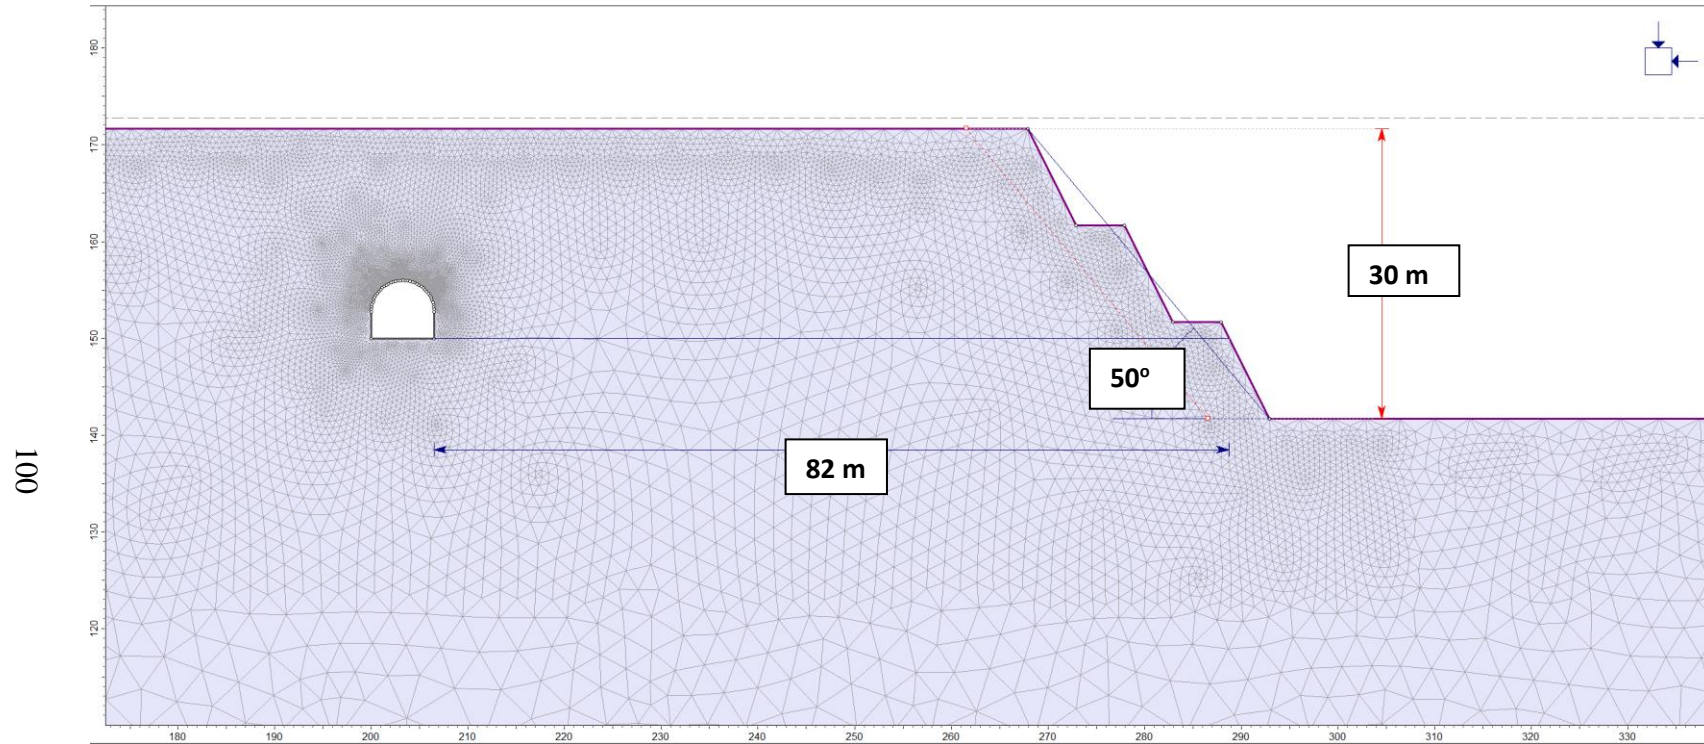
Slope dimensions and finite element model of the planned slope profile, section A-A', Km 26+690
